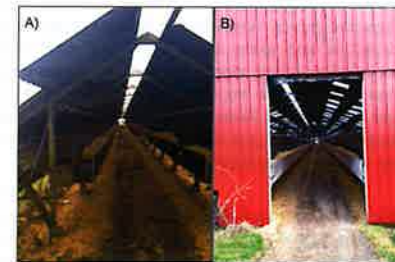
Animal shed structures have different constructions styles A) Animal shed of Location 1; B) Animal shed of Location 2.
